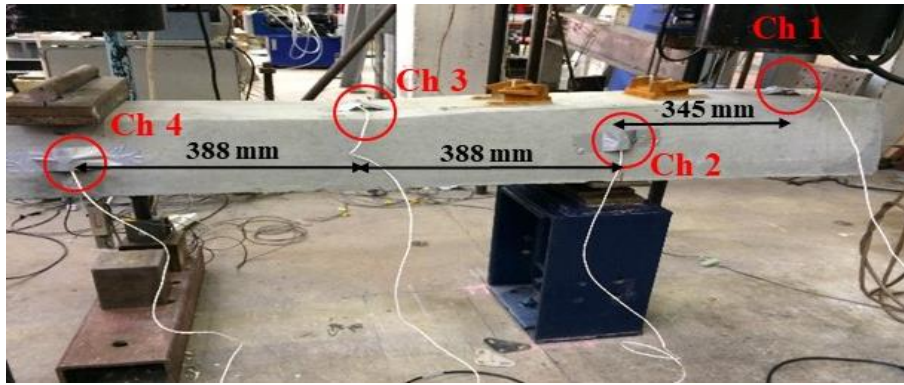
Static loading layout for railway concrete sleepers with location of AE sensors (positive bending configuration).
